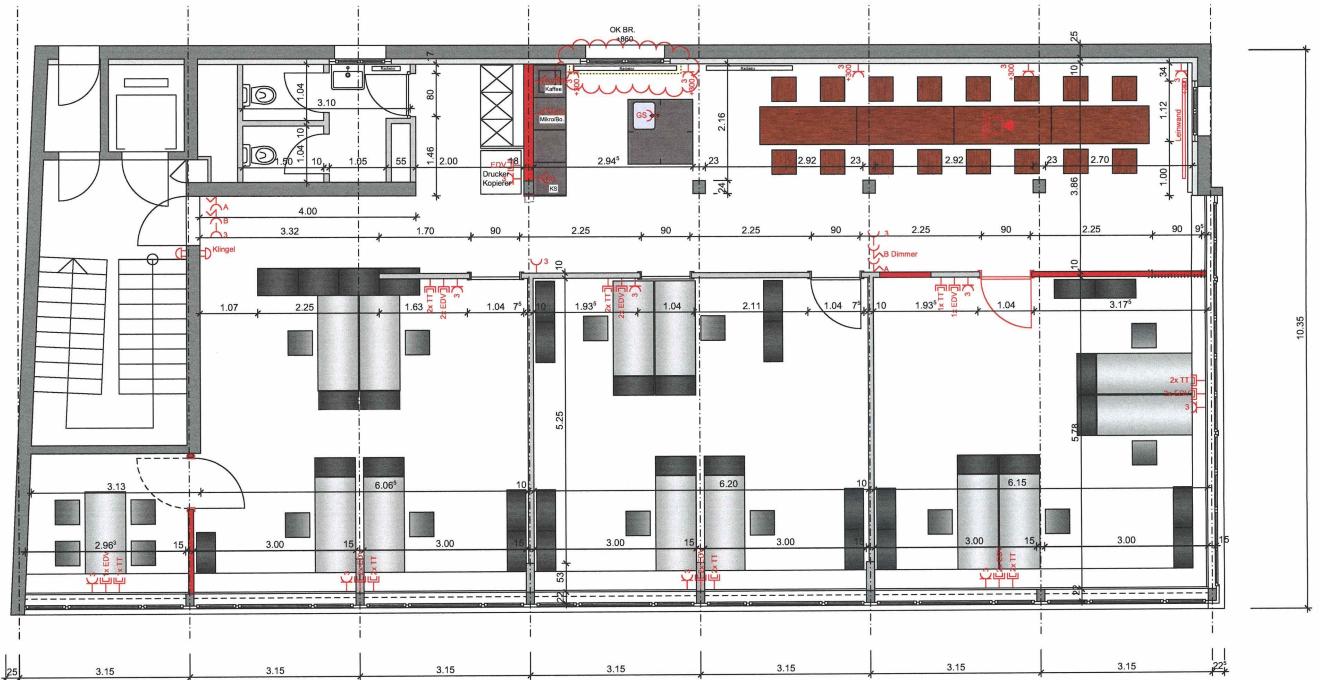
Floor plan of office building (Sumatra) 3rd floor
